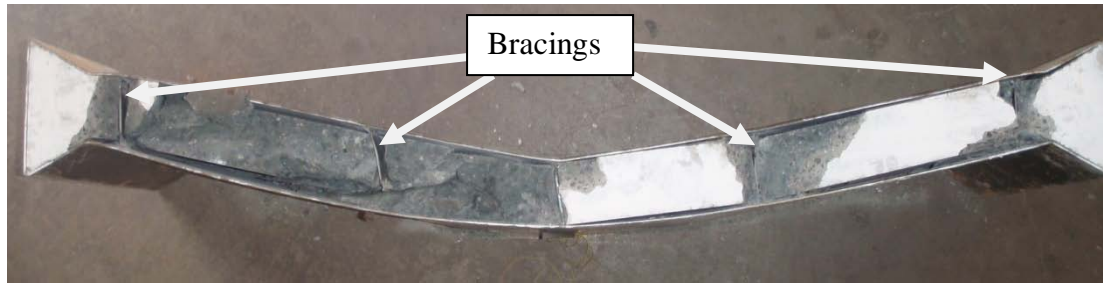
Damage of concrete for the Panel with bracing elements.
